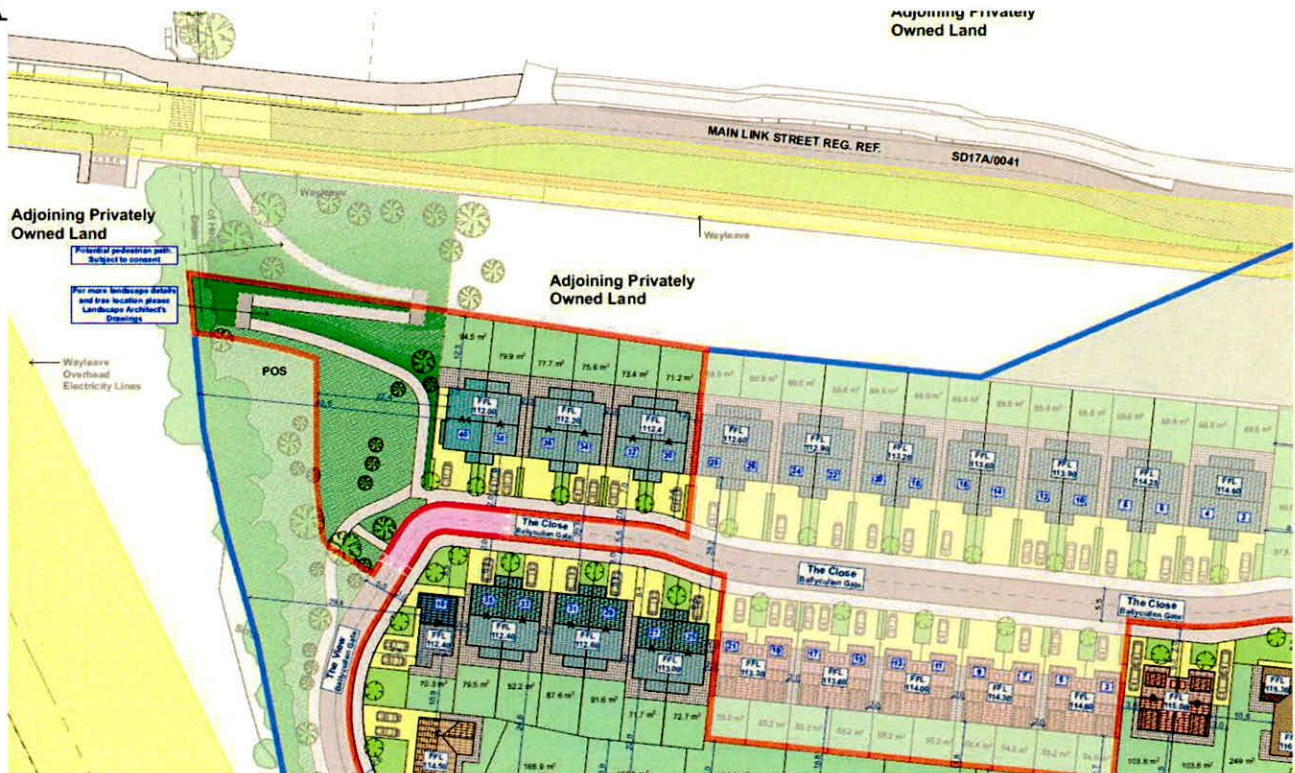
Extract from current submitted proposed permitted site layout plan
